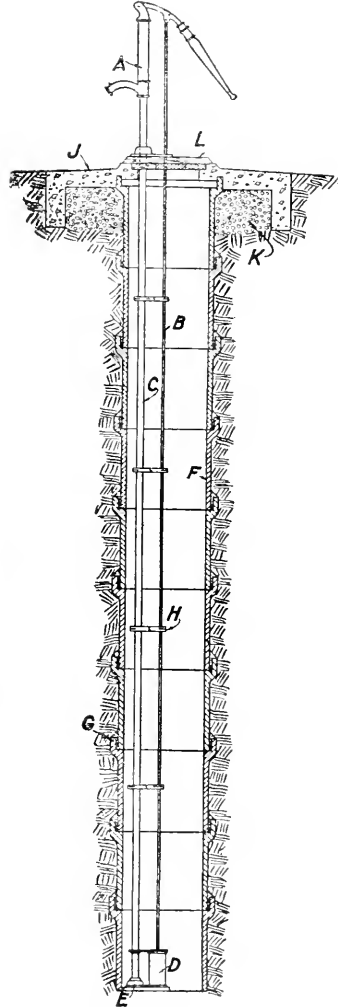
Section of a dug well with pump showing proper type of casing and protection about the top. Curbed with vitrified socket pipe. (a) Pump stand; (b) pump rod; (c) riser pipe; (d) cylinder; (e) check valve; (f) vitrified socket pipe; (g) joints packed with a strand of oakum dipped in grout and filled with cement mortar; (h) pump rod guides; (j) platform; (k) gravel foundation; (l) cross-planked cover.
